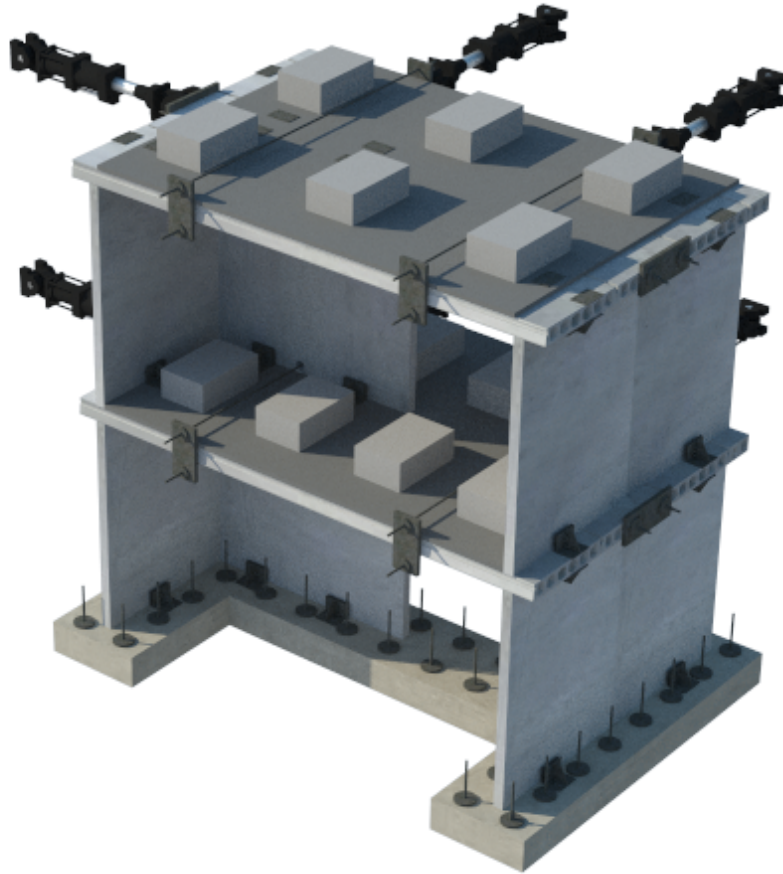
Isometric views of the installed instrumentation – Top side, front view.
